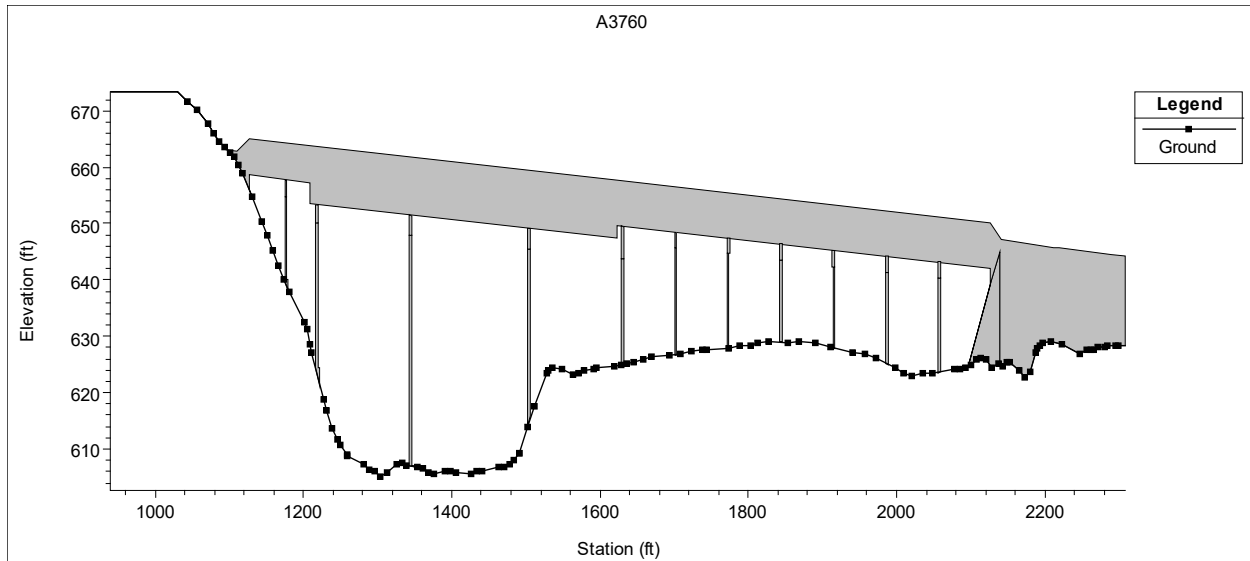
Example bridge cross section from the Gasconade River (A-3760) site.
